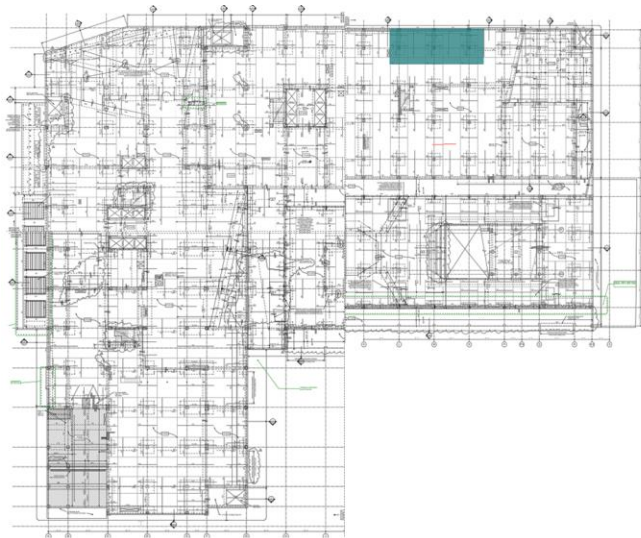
Level 1 Module Area Location (Original Drawing Courtesy of Gensler)
